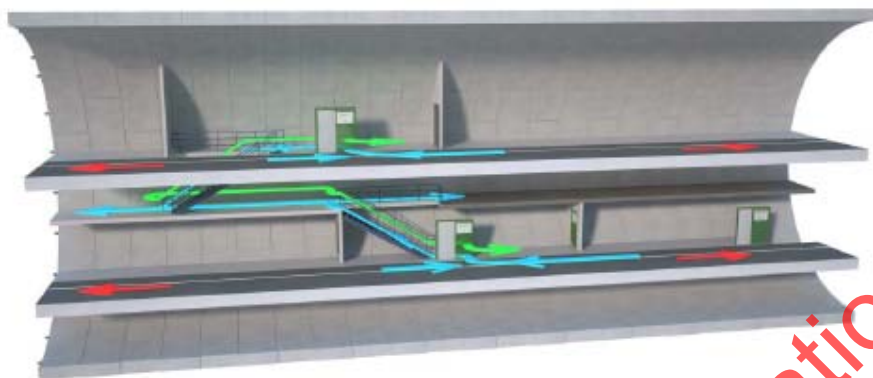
Alaskan Way - Longitudinal section through 3D model showing escape routes between decks
